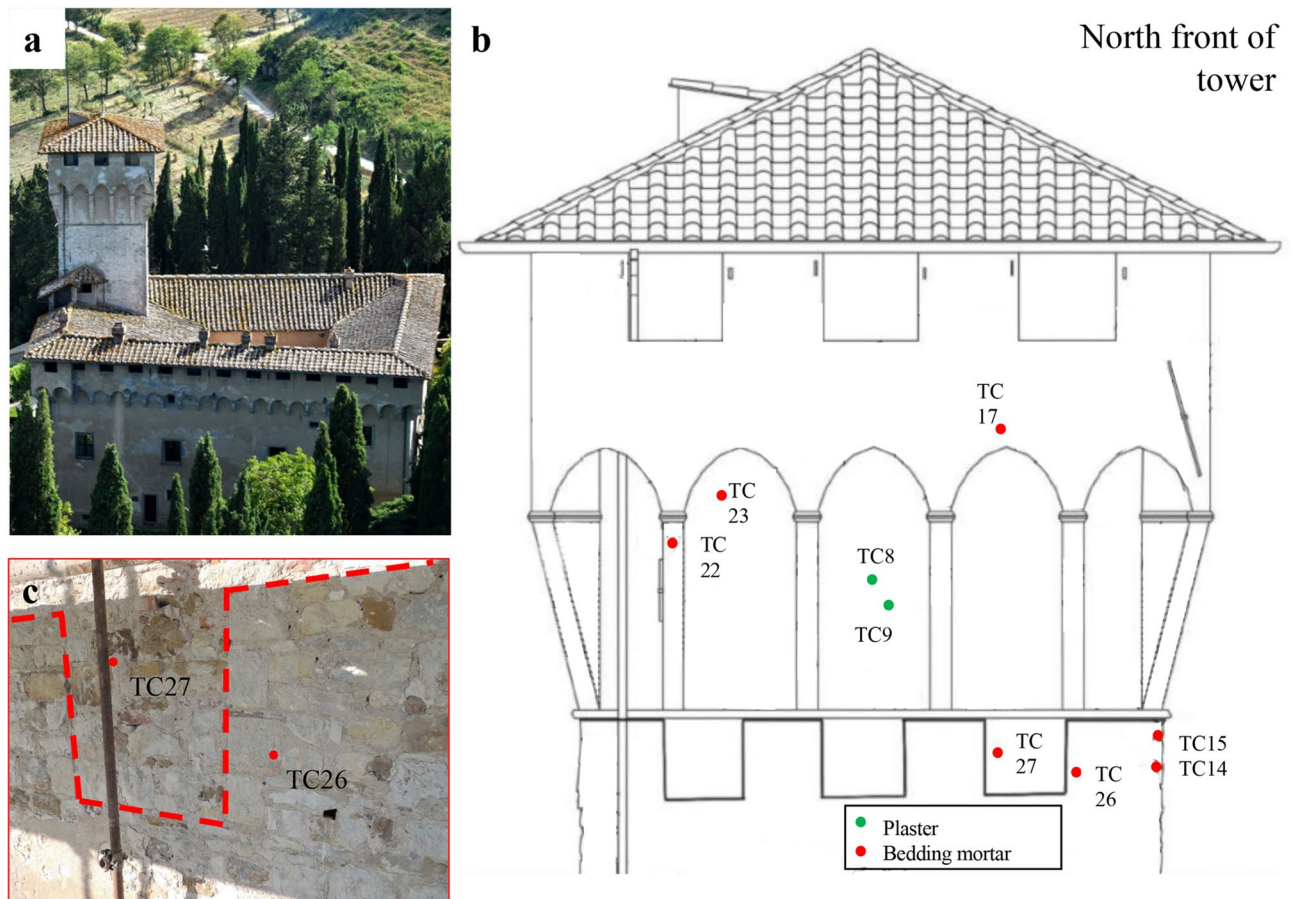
Trebbio Castle: building (a); sampling on the North side, perspective drawing (by Teresa Salvatici and Sara Calandra) (b), and masonry (c).
